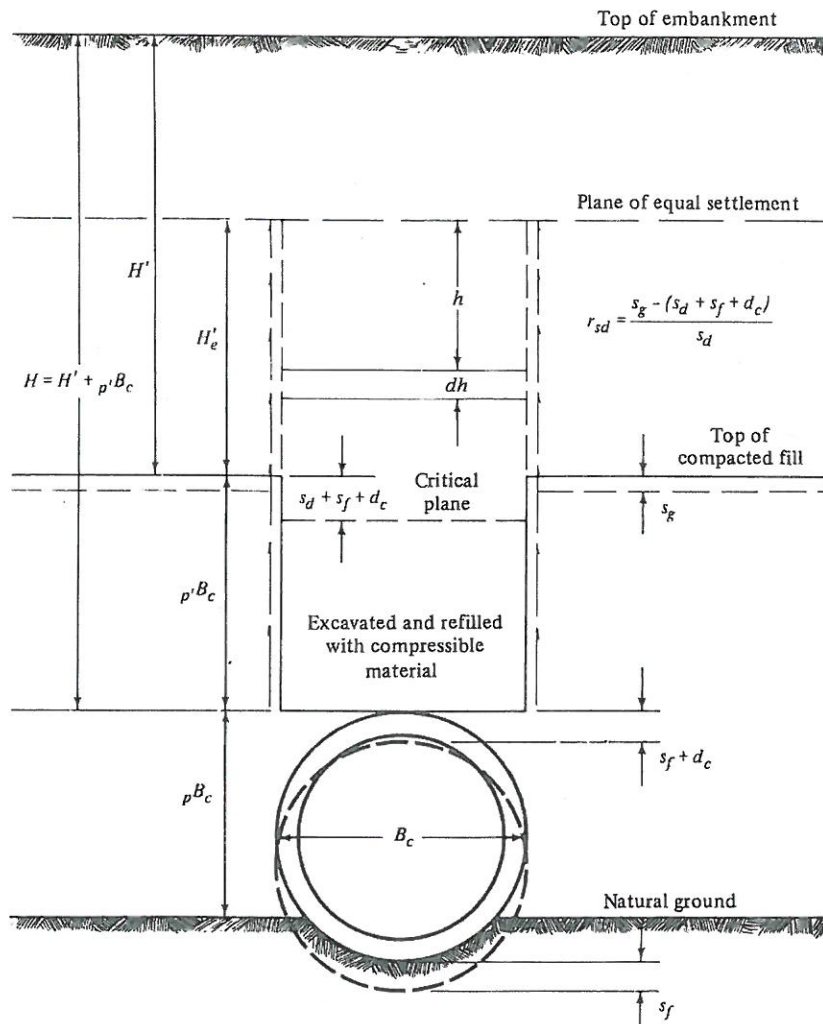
Settlements which influence loads on imperfect ditch conduits. Key: solid line, initial elevation ( $H = 0$ ); dashed line, final elevation.
